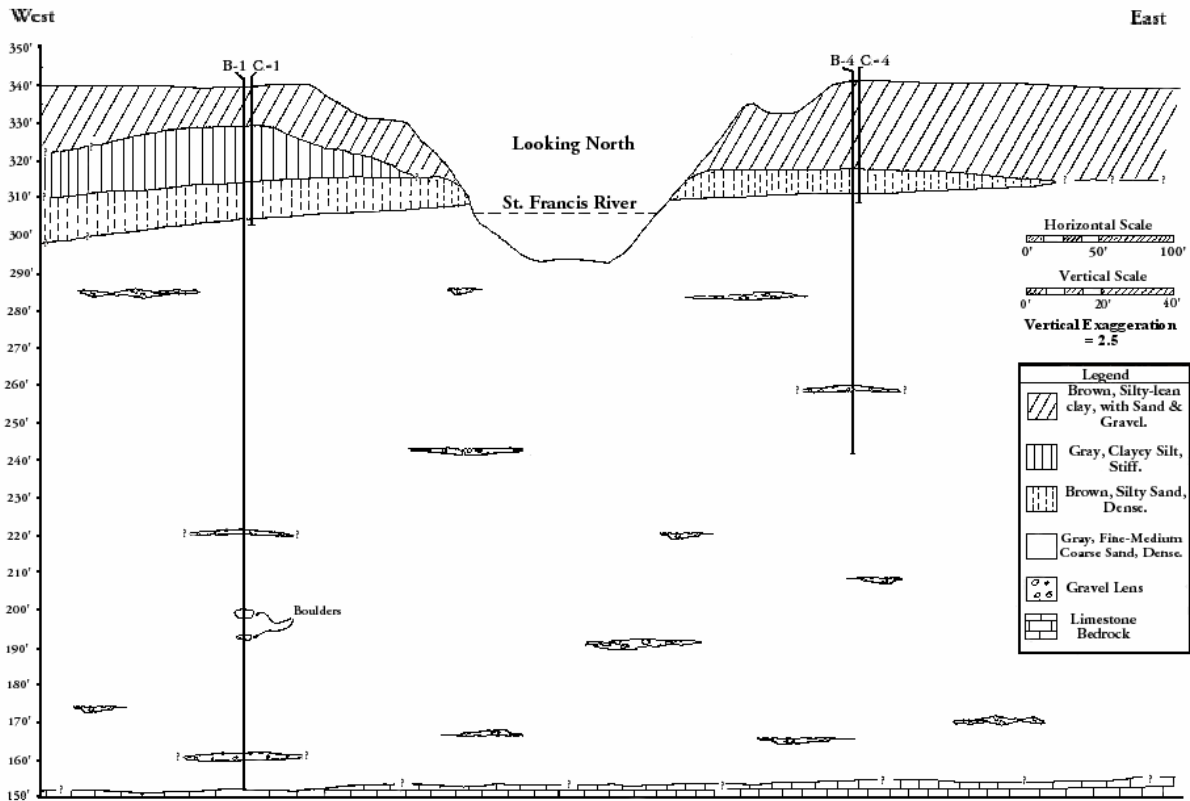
St. Francis River Site Topography, Cross-Section and Boring Locations
